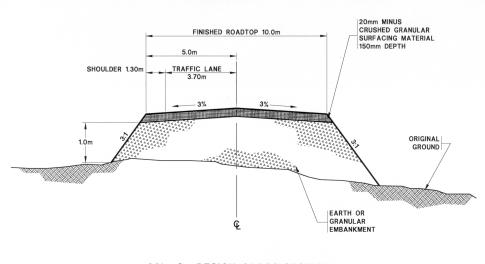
TYPICAL DESIGN CROSS SECTION (60 km/hr Design)
